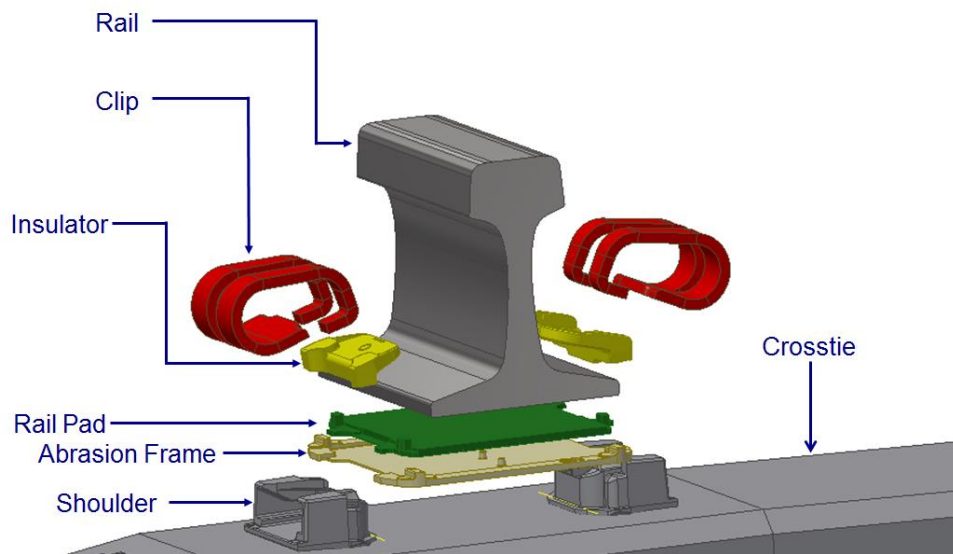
Assembly of Concrete Crosstie and Fastening System
